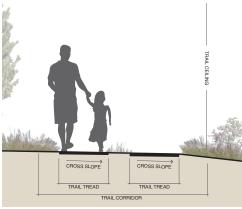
Multi-Use Trail Layout, Section, and Allowed Users
